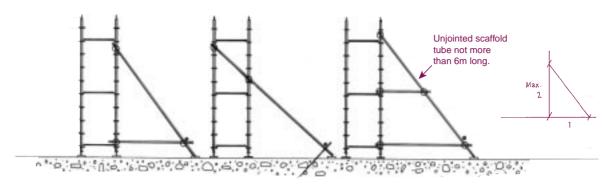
Stabilising a scaffold less than 6m. high - Raking Tubes
